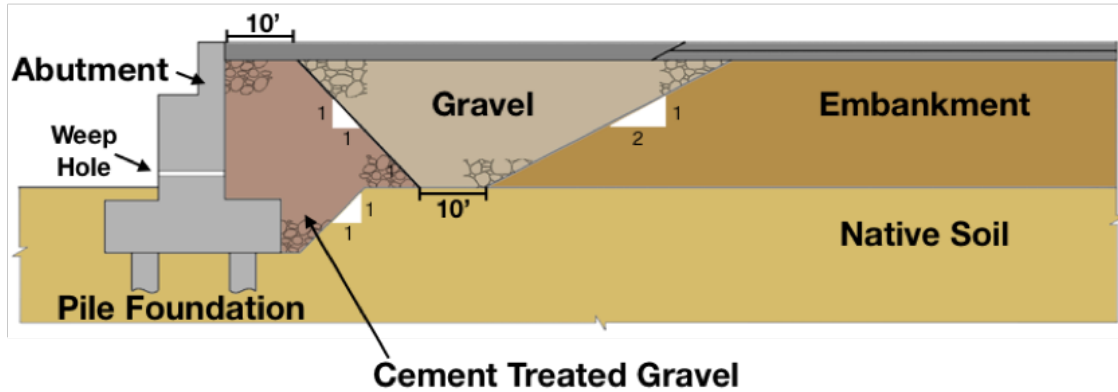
California high-speed rail bridge abutment transition backfill configuration.
